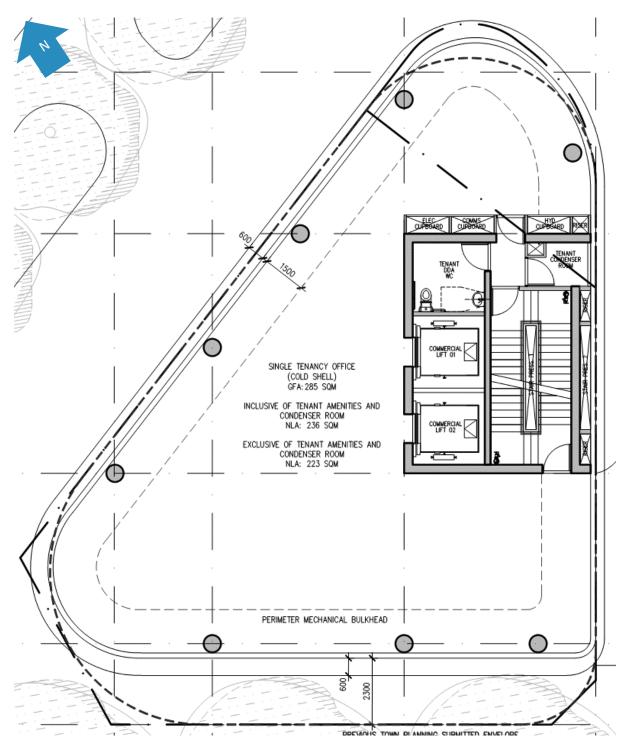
Proposed Floor Plans – Level 5 (Image Source: Elenberg Fraser)
